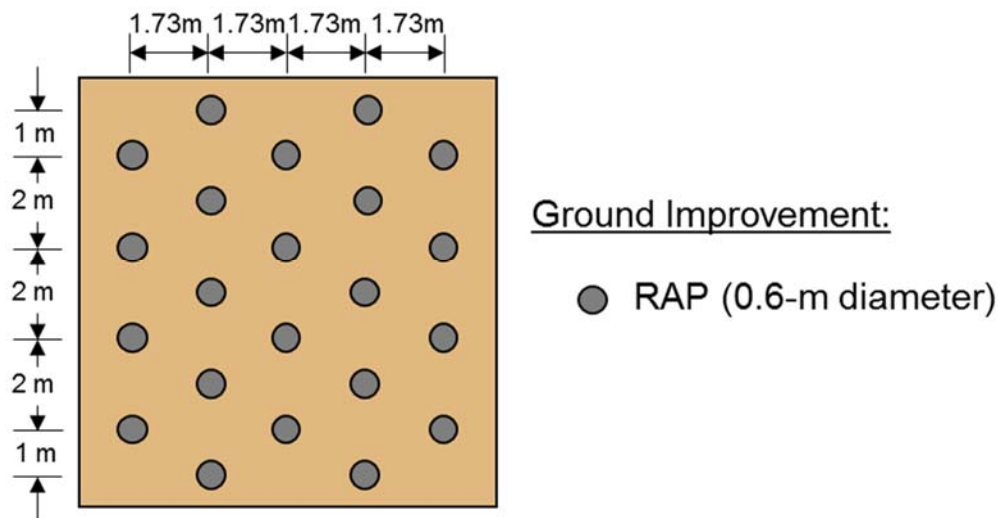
Plan view of the RAP impact points layout used at Sites 3, 4, and 6.
